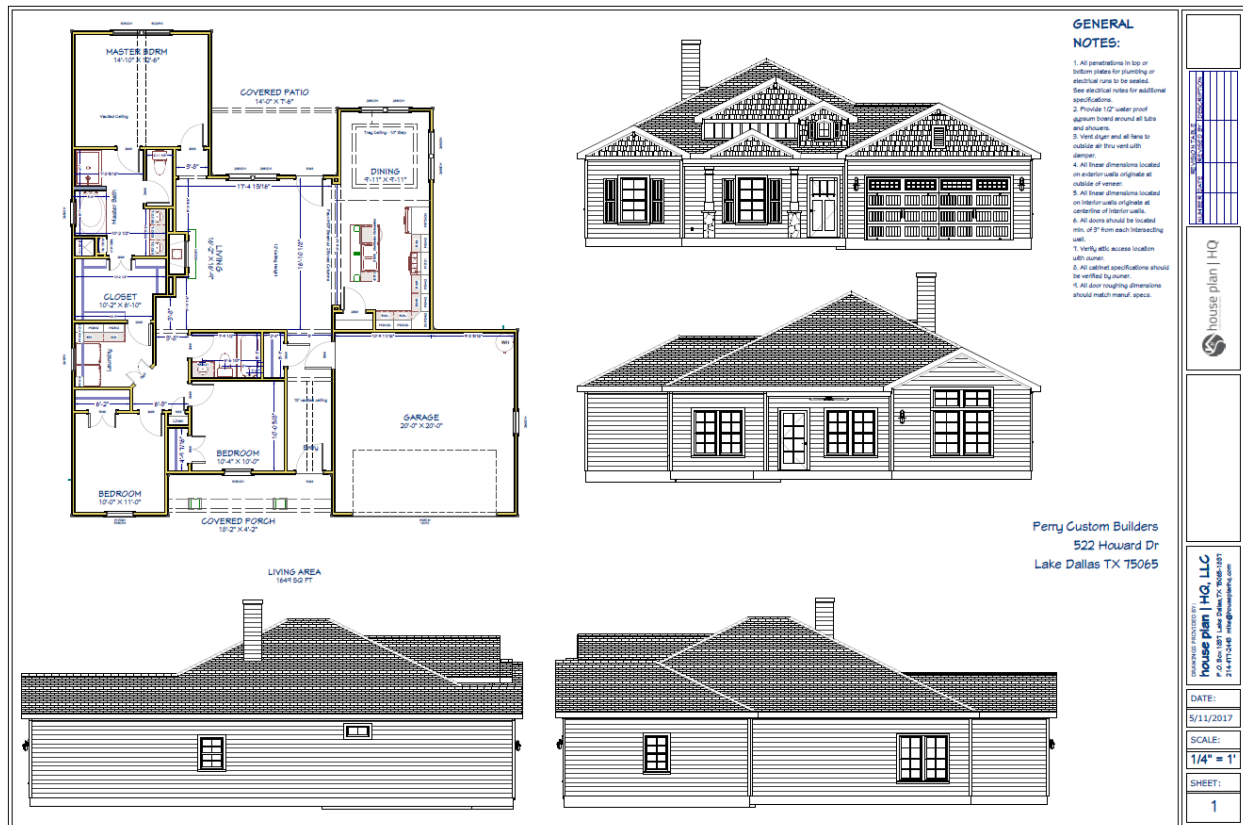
Proposed Residence for Howard Drive with Concrete Plank Siding.
